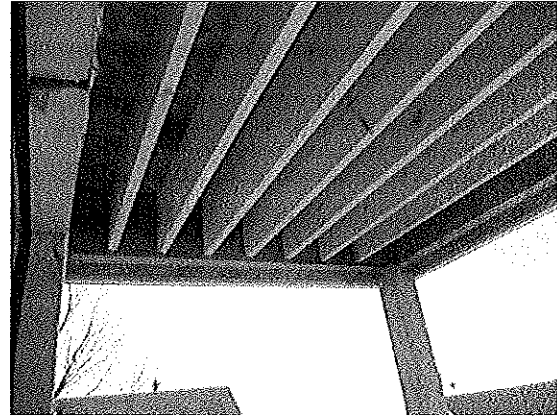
1<sup>st</sup> Flr: Inadequate stringer connection
